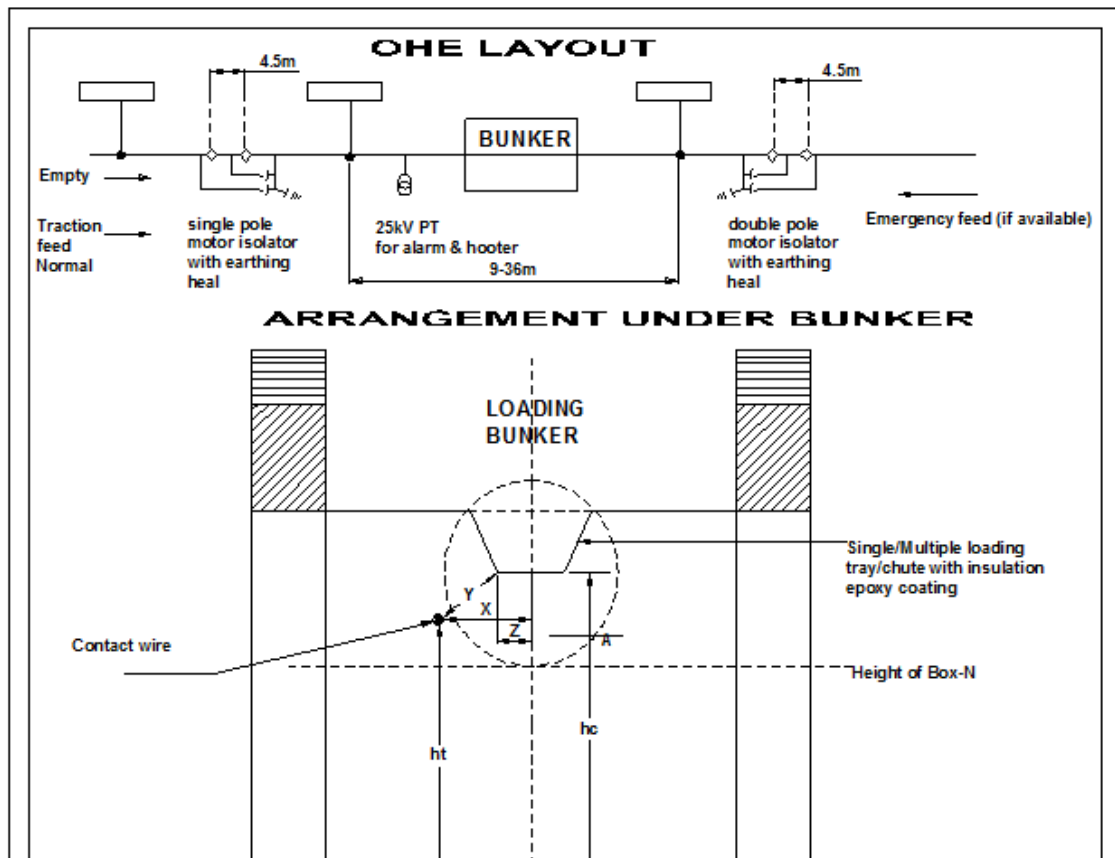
OHE layout for loading siding & arrangement under the loading area
